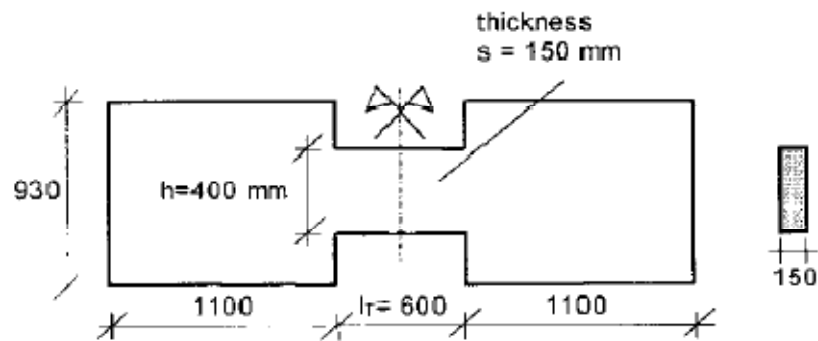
Dimensions of the Coupling Beam (Galano and Vignoli 2000)
